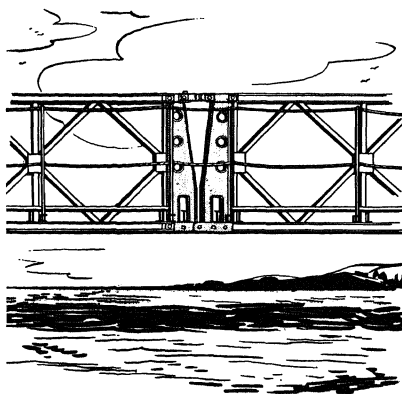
Use of span junction posts to suspend connecting span between bridge bays.
